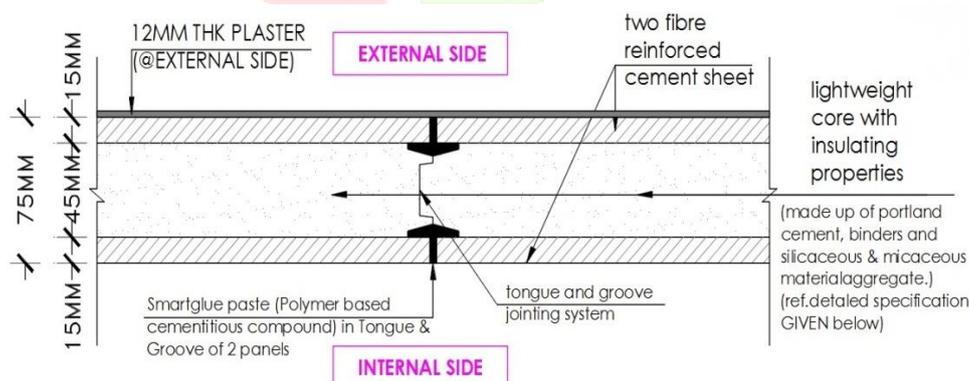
Detailed wall Section for Aerocon Panel (75mm thk.)
